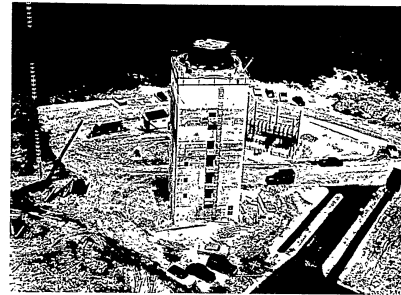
Aerial view of tower and roof taken after the concrete parapet was poured, and showing status of project on 23 May 1958.
